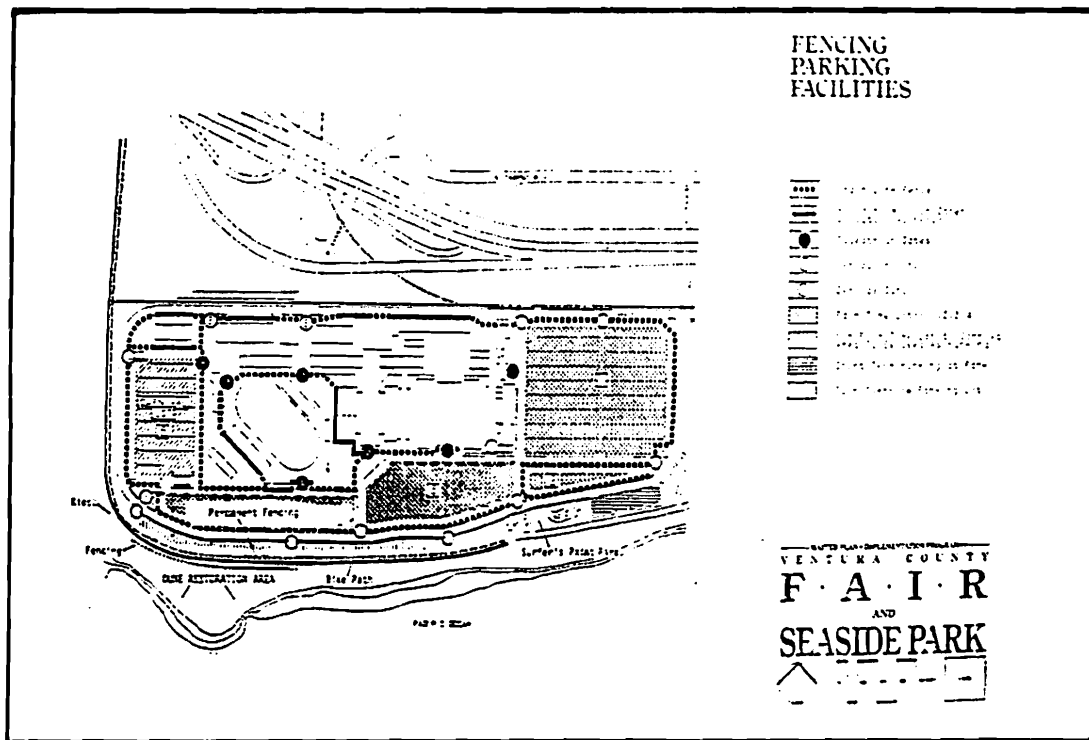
Ventura County Fairgrounds Master Plan Parking Plan.
